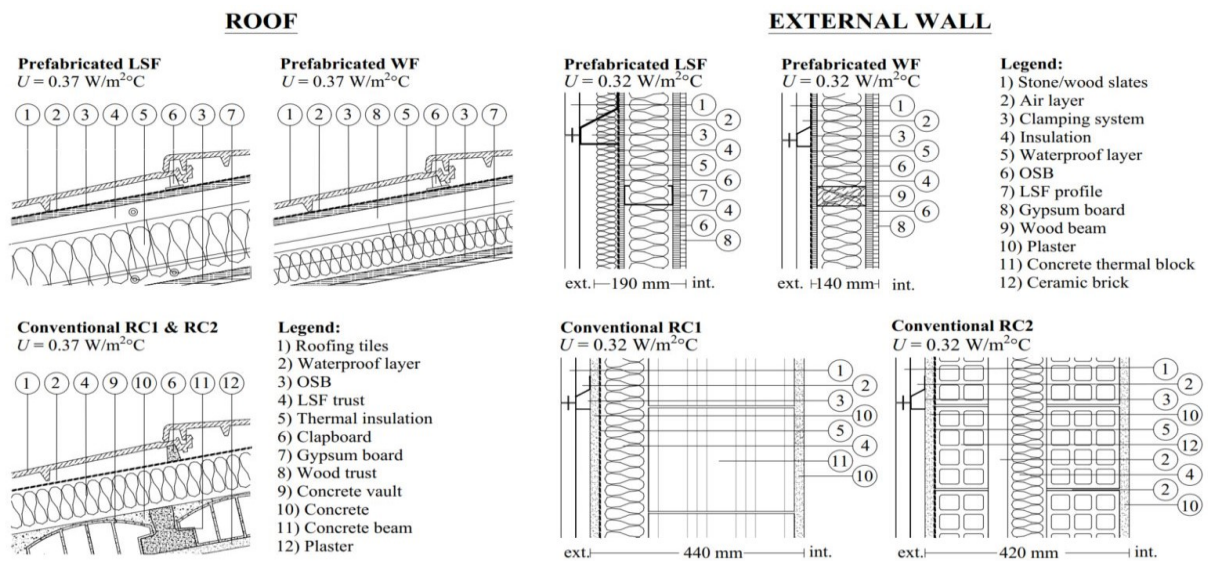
Cross-section of the roof and the external wall of the prefabricated (LSF and WF) and conventional (RC1 and RC2) construction (not to scale).
